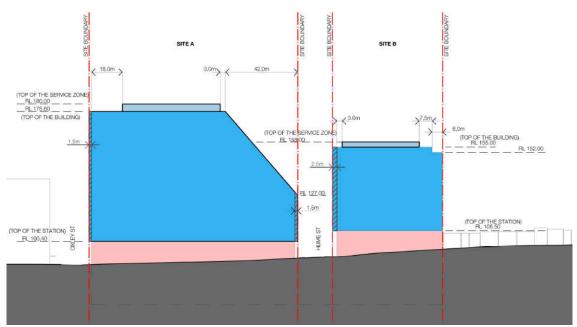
West elevation of the building envelope under the Amended Scheme, showing CSSI Approval (pink) and OSD components (blue)
